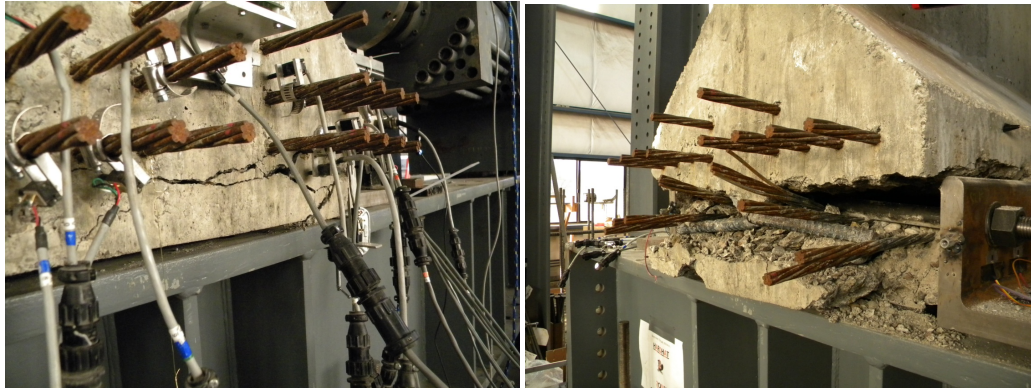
Initial cracking (a) and cracking at failure (b) for specimen TB-3.
